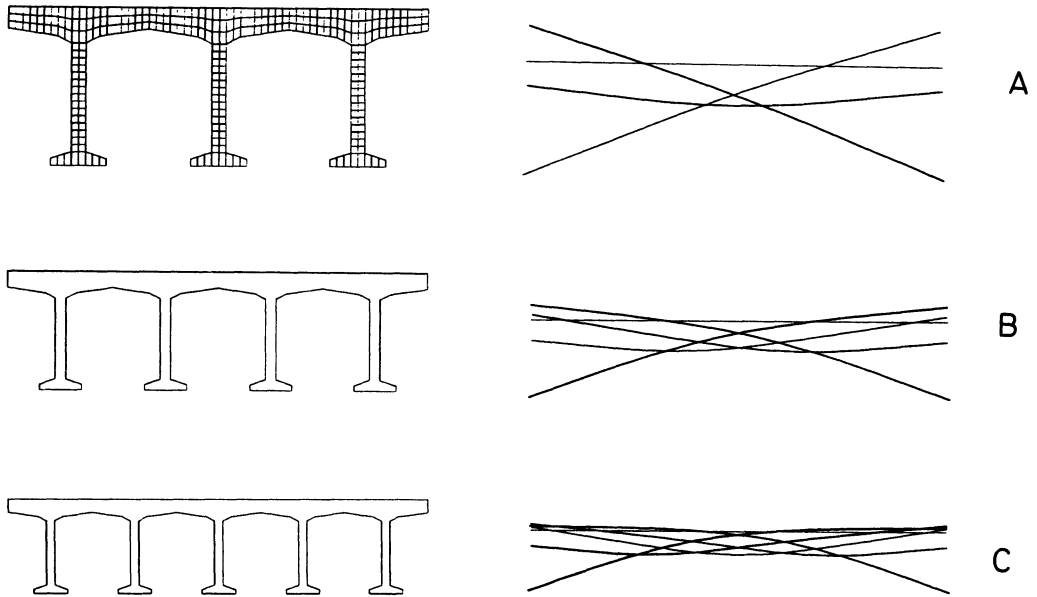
Parametric study of the transverse load distribution for a prestressed concrete bridge.
